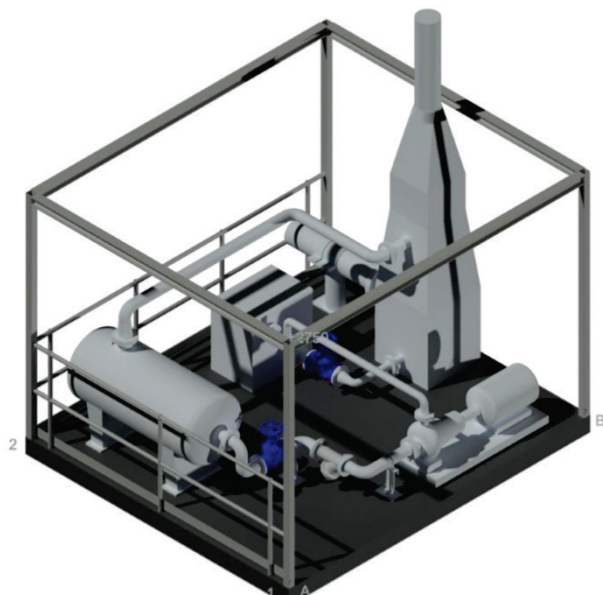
Block of cogeneration plant modeled in AutoCAD Plant 3D
